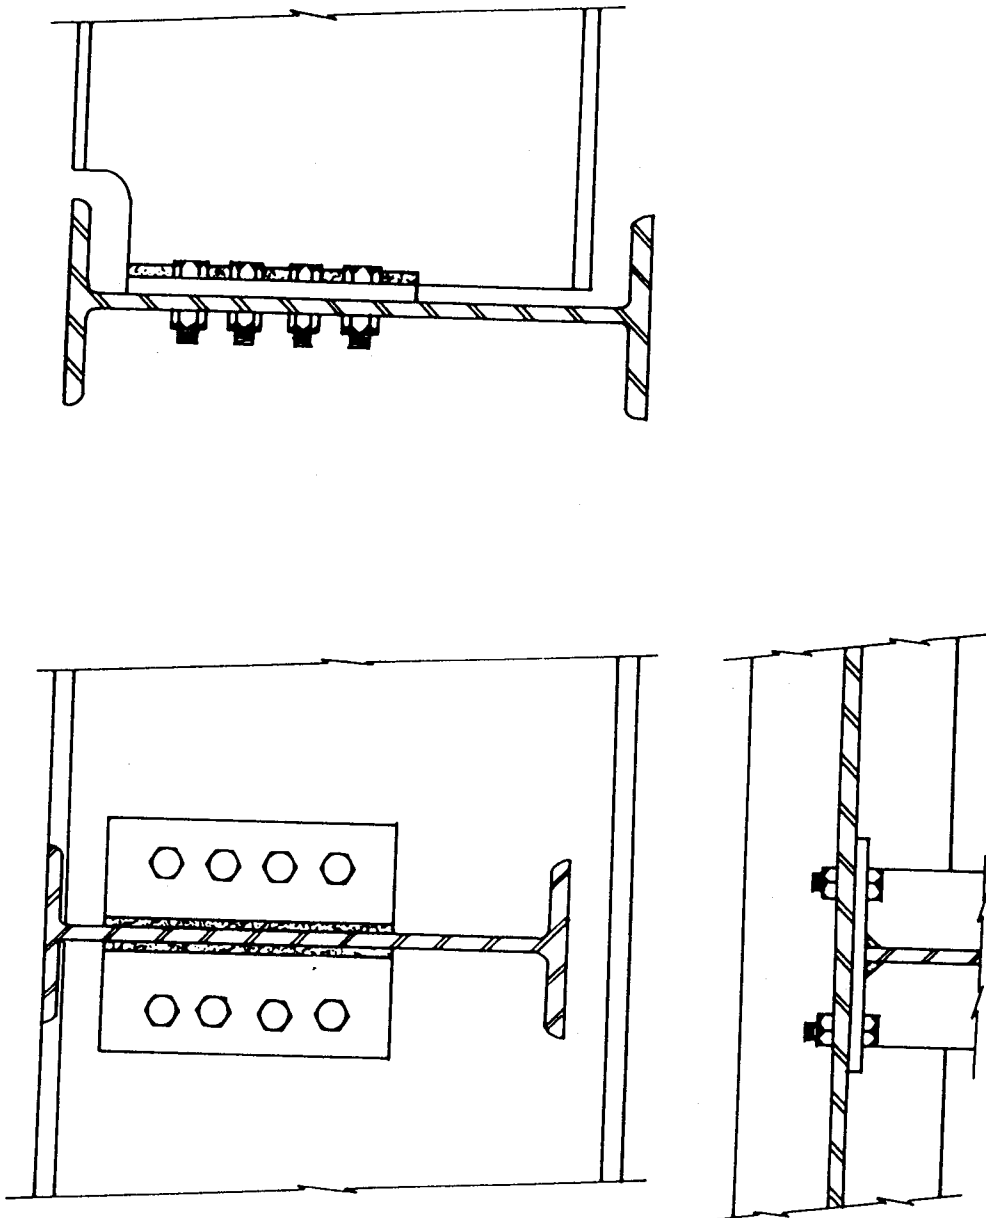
Single Flexible End Plate Connection to Beam Web Detail
